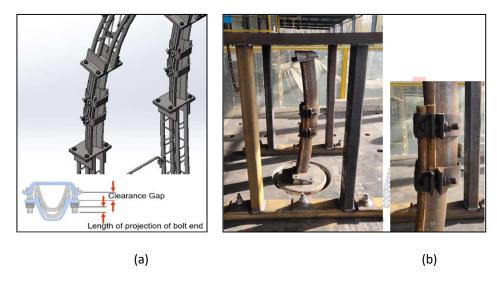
Lattice Girders TH29 yielding joint details: a) clamp details; b) details of testing to establish torque on nuts/bolts
